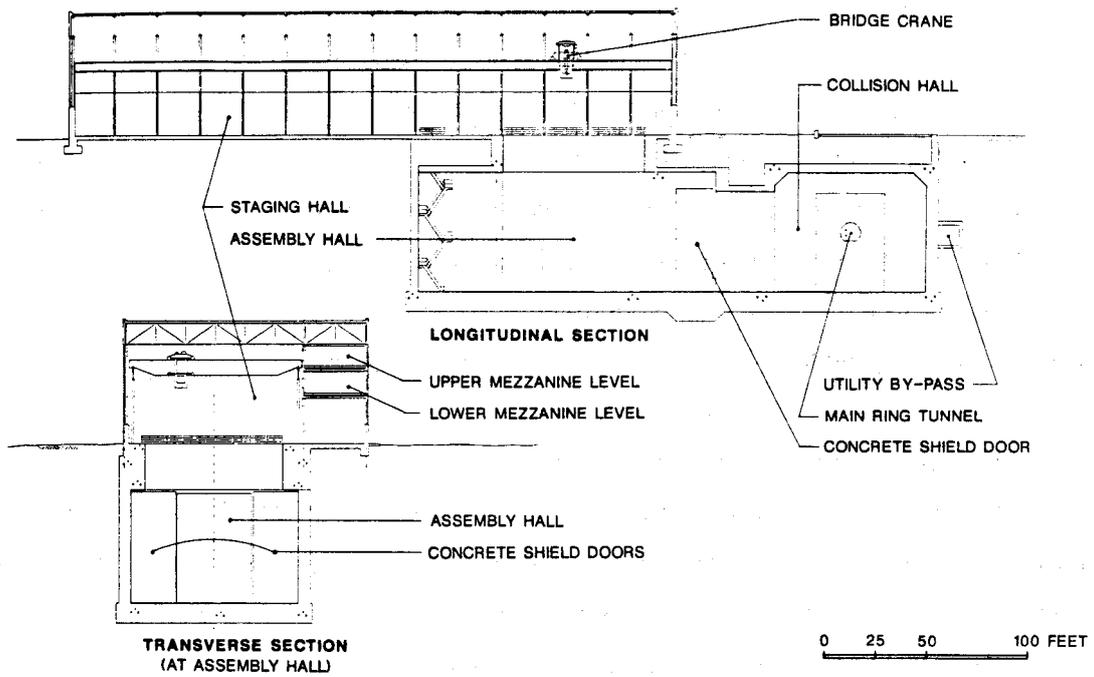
Cross section view of typical staging building, showing building elements, high-bay area and assembly area.
